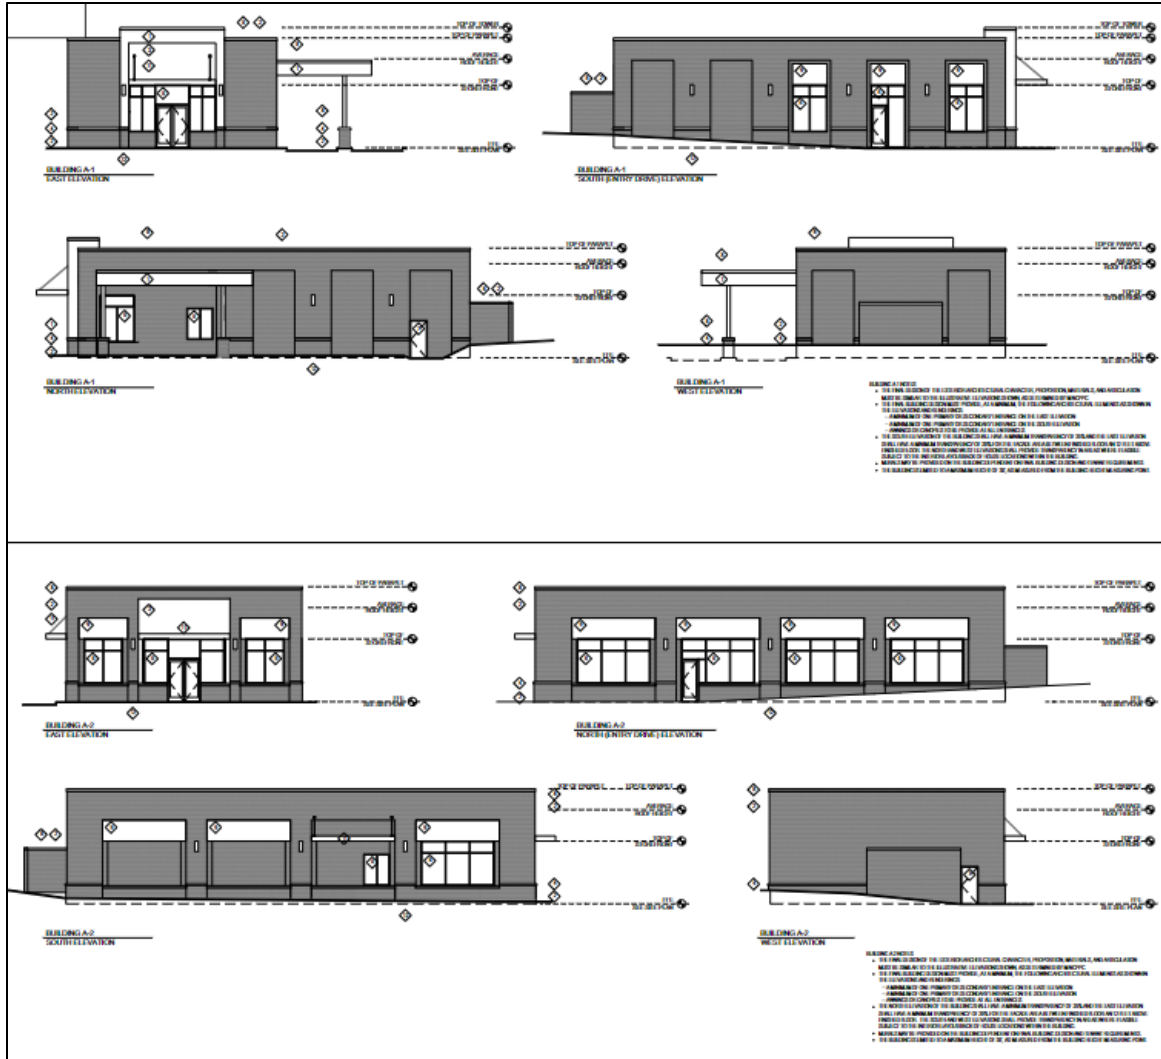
Proposed Architectural Elevations for Buildings A-1 and A-2
